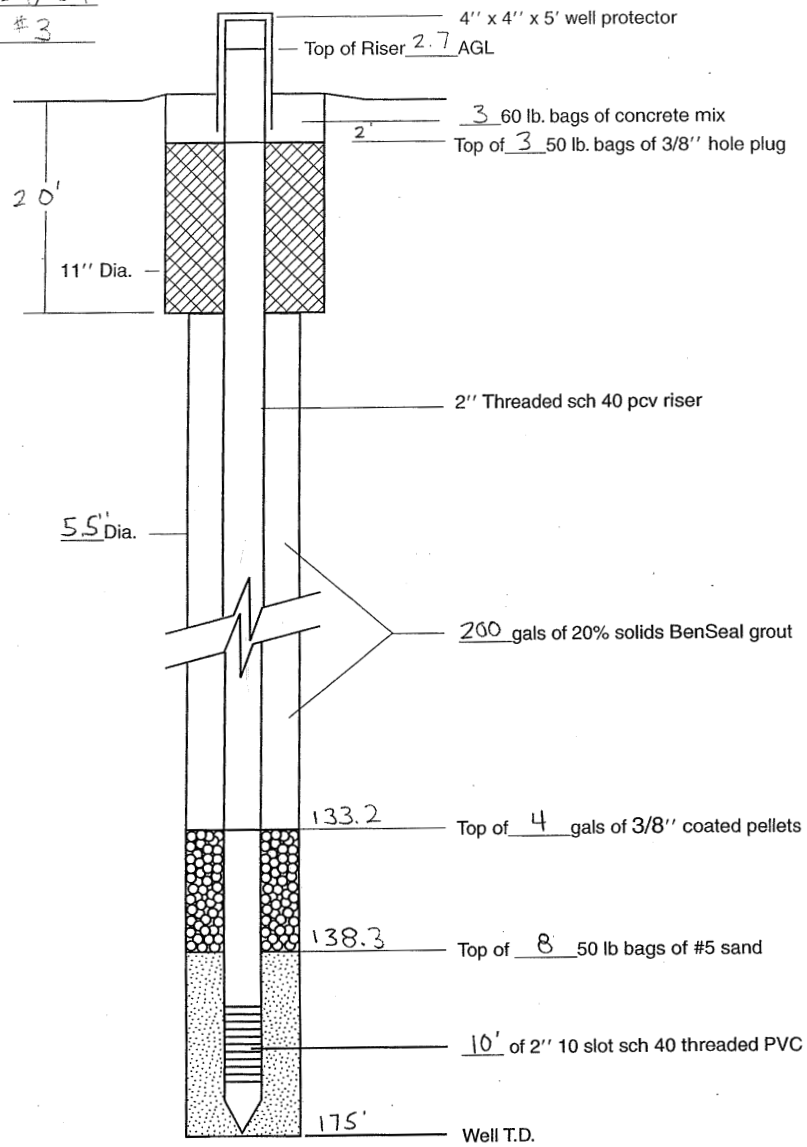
Details of groundwater monitoring well construction, MH-3.
